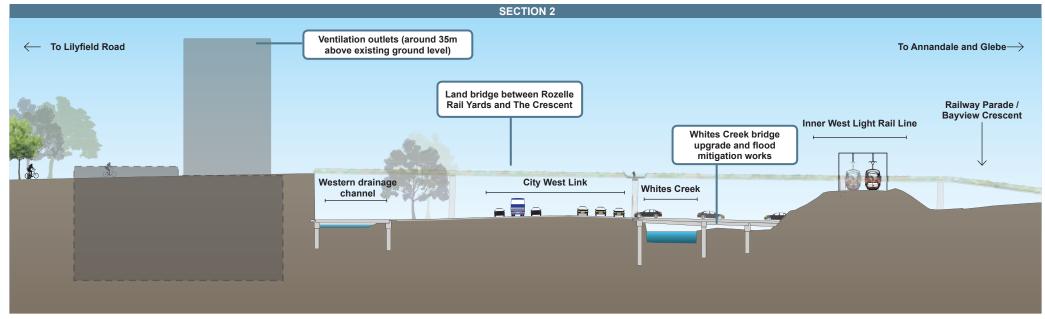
Long-section of the Rozelle Rail Yards - north-south - section 2
